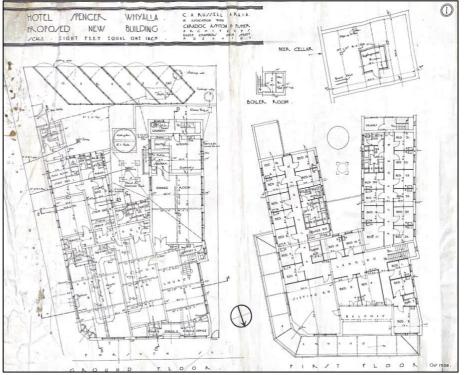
Stage 1 Spencer Hotel drawings as held by Louis Laybourne Smith Architecture Museum, as designed by CA Russell in association with Caradoc Ashton & Fisher. Floor Plans
